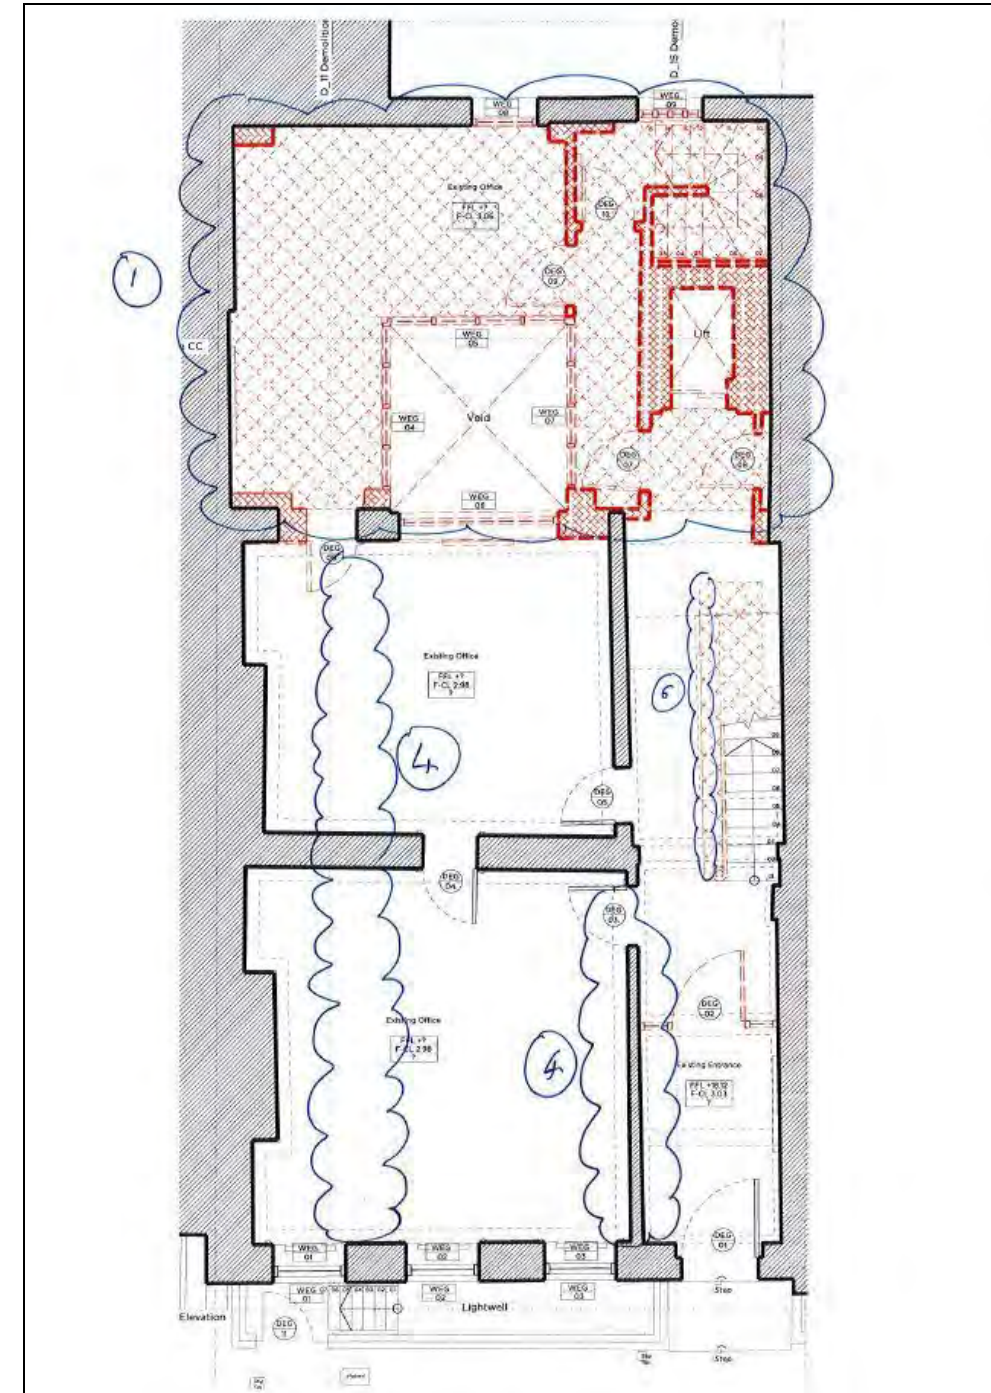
Existing Ground Floor Layout (demolition shown hatched red)
